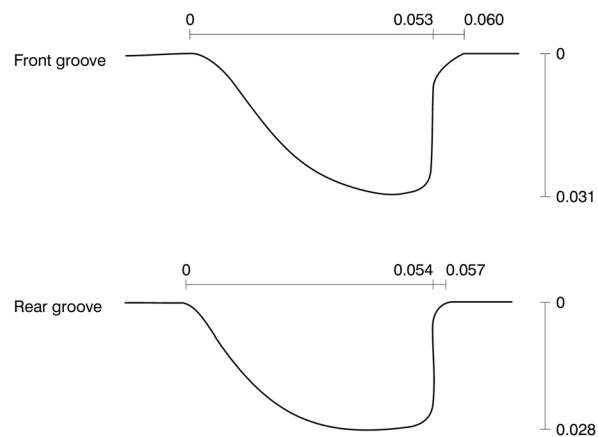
Block 145, section drawing of the grooves on the top surface. (Drawing: Pakkanen)
